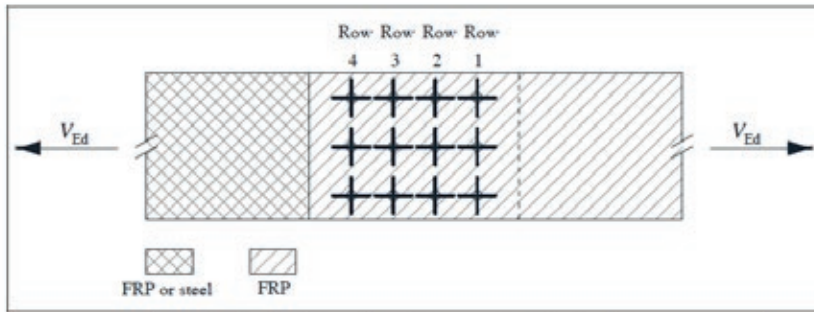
layout of multi-bolted lap shear (connection) joint between two plate elements of which at least one is of FRP material.
